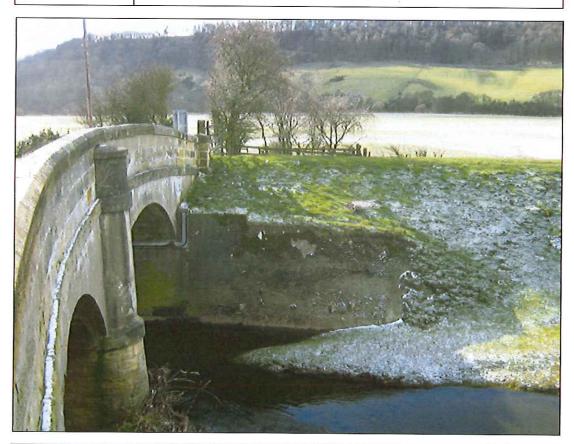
Eastern downstream elevation southern span with rendered mass concrete arch widening and spandrel walls.
